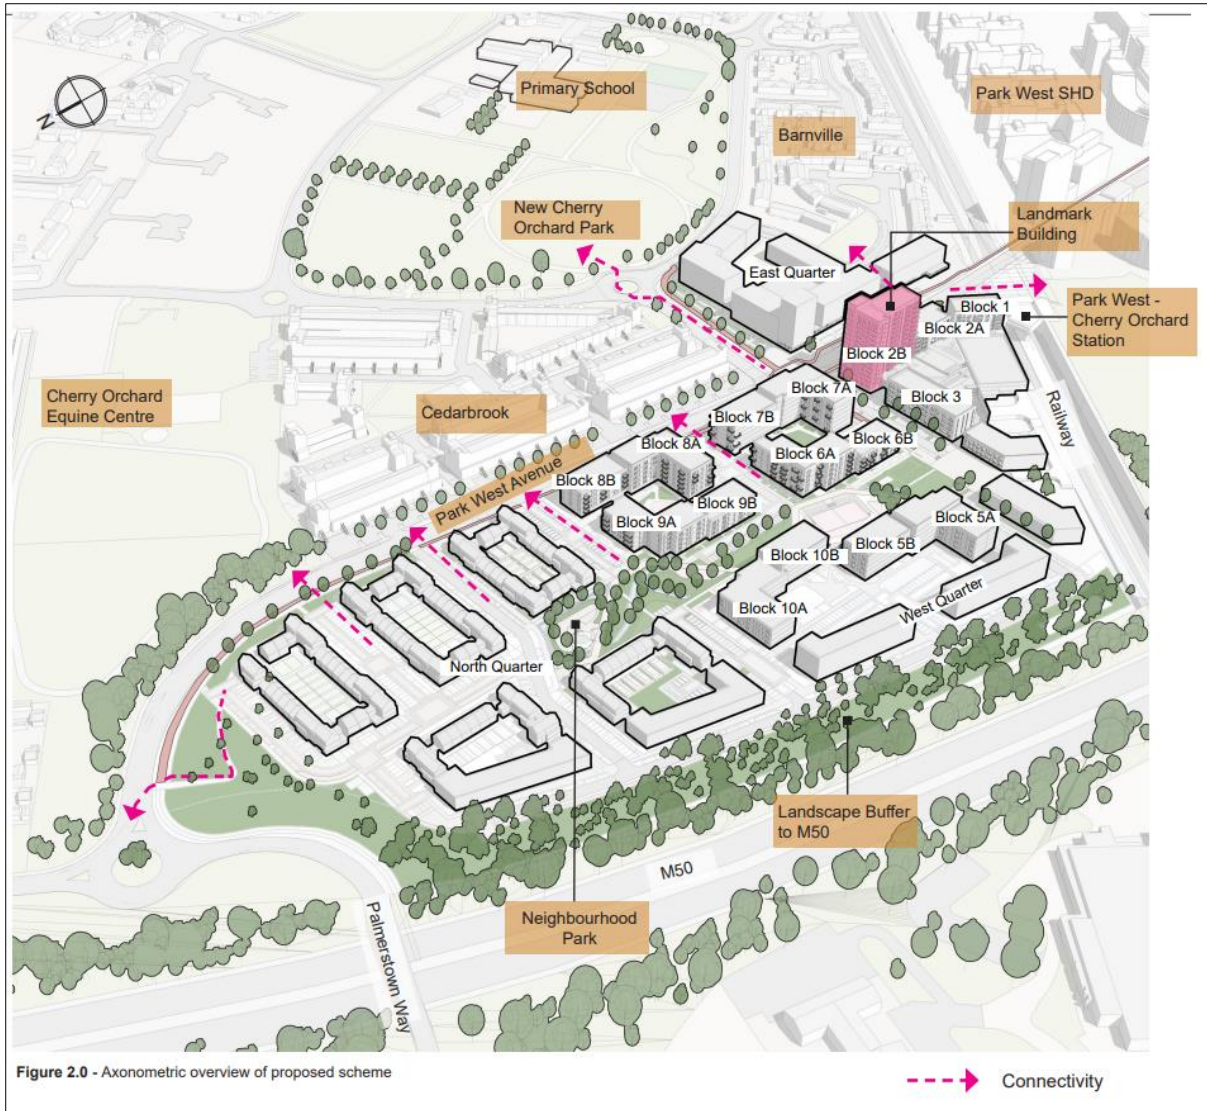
Proposed Development Layout Strategy (Source: Architectural Design Statement)
